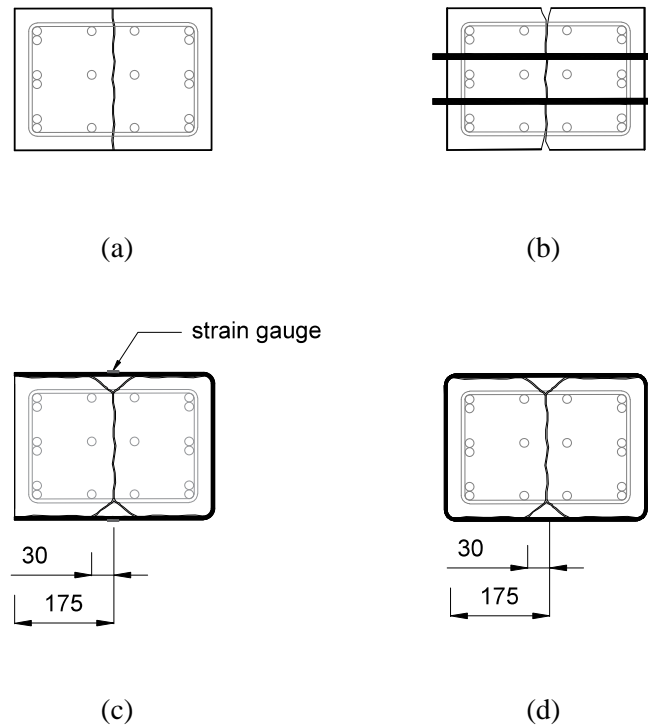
Push-off specimens – failure modes: (a) unstrengthened control specimen, (b) deep embedment specimen, (c) specimen strengthened with CFRP wrap in a U-wrap configuration showing positioning of the strain gauges at the shear crack location and (d) in a fully wrapped configuration.
